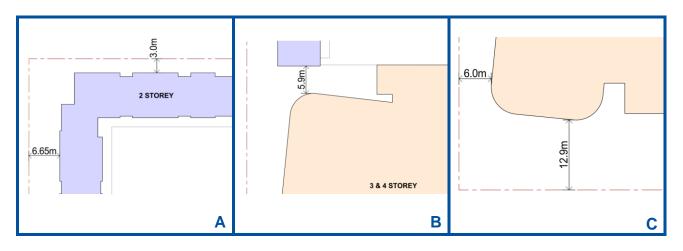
Building separation and setback requirements for a development containing retail, commercial and other nonresidential land uses.
